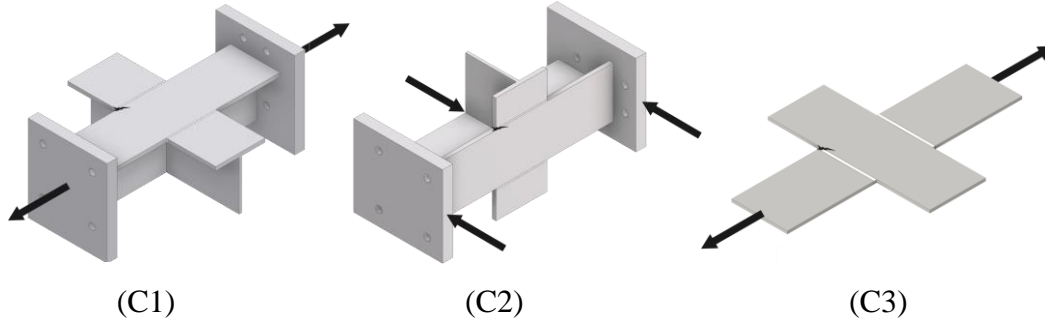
Specimen loading configurations for the full scale component tests (C1 and C2) and the half-scale component tests (C3)
